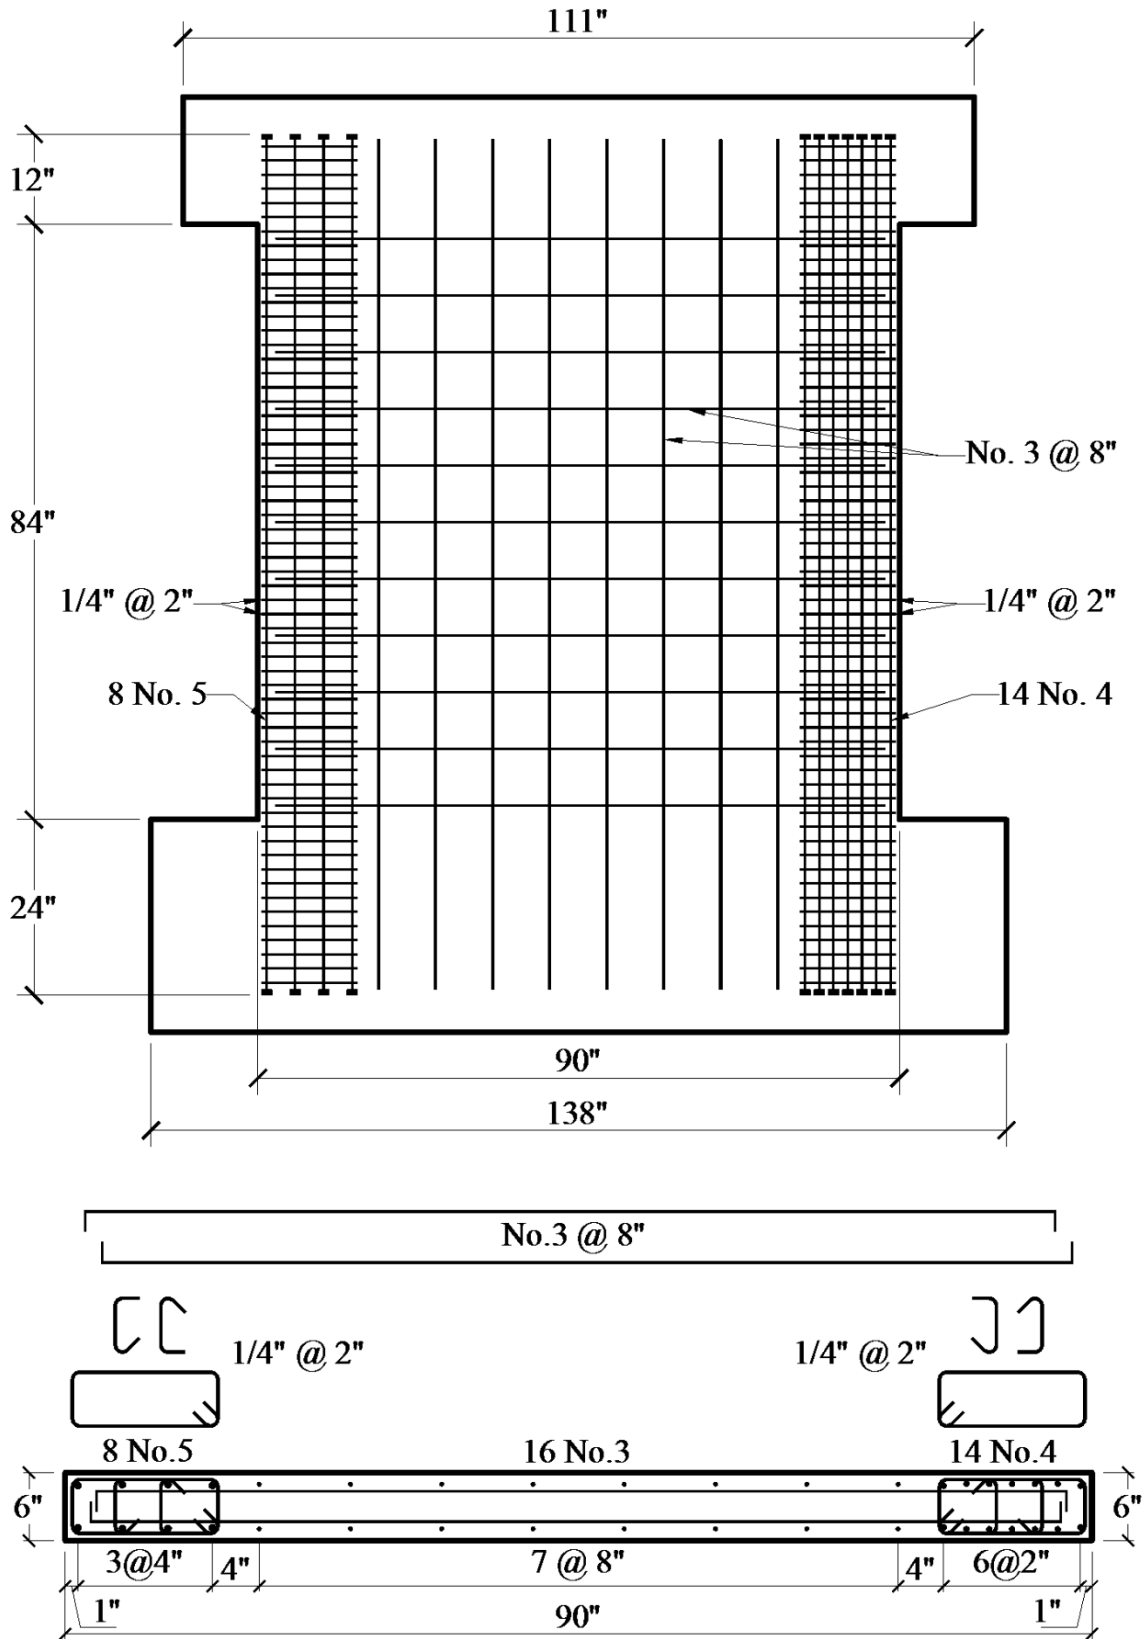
Specimen WP1 reinforcement (Conversion: 1"=25.4 mm)
